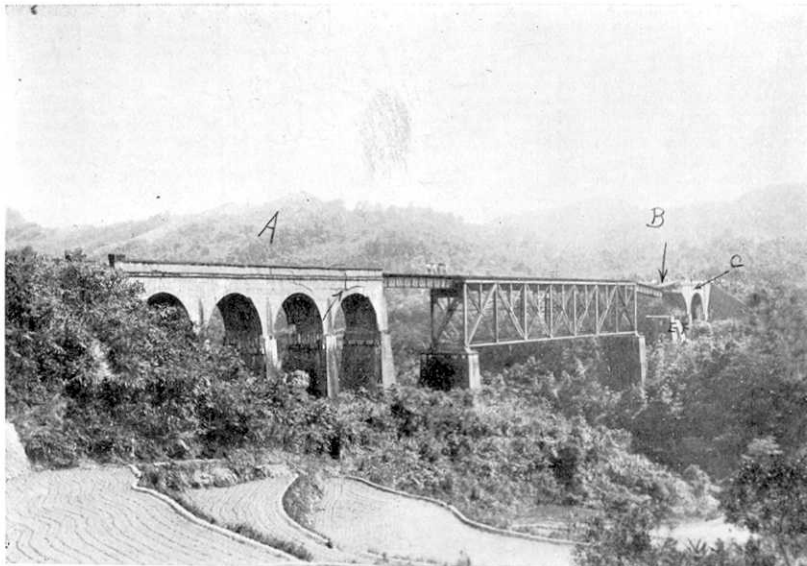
The south portal of No. 4 tunnel, between Taian and Zyüroppun stations, Sansa-syô.
